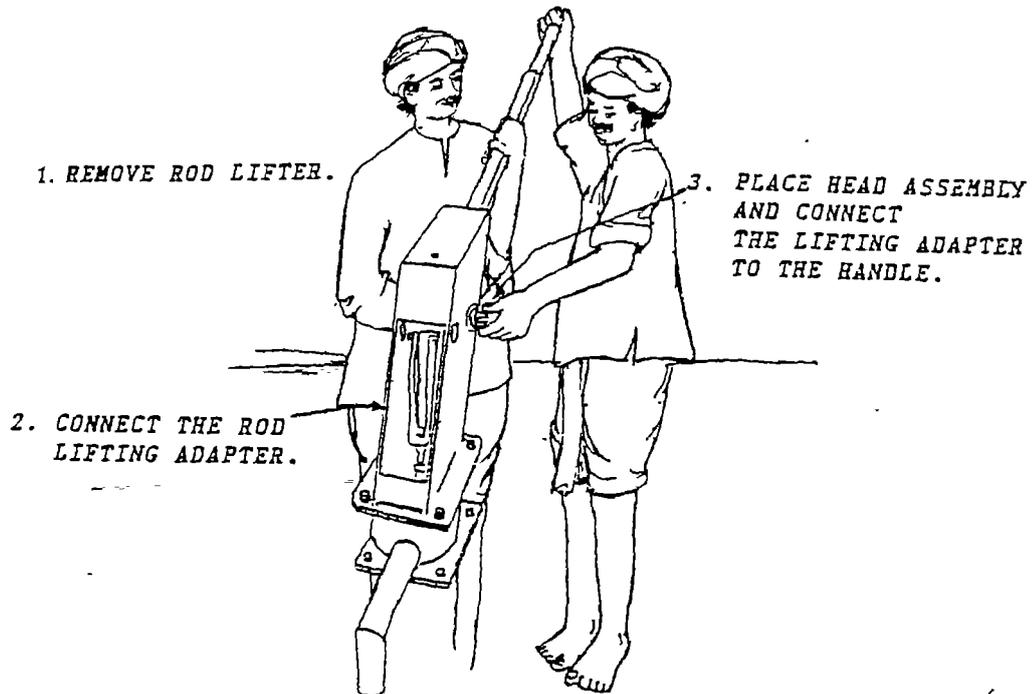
FIX HEAD ASSEMBLY & HANDLE
